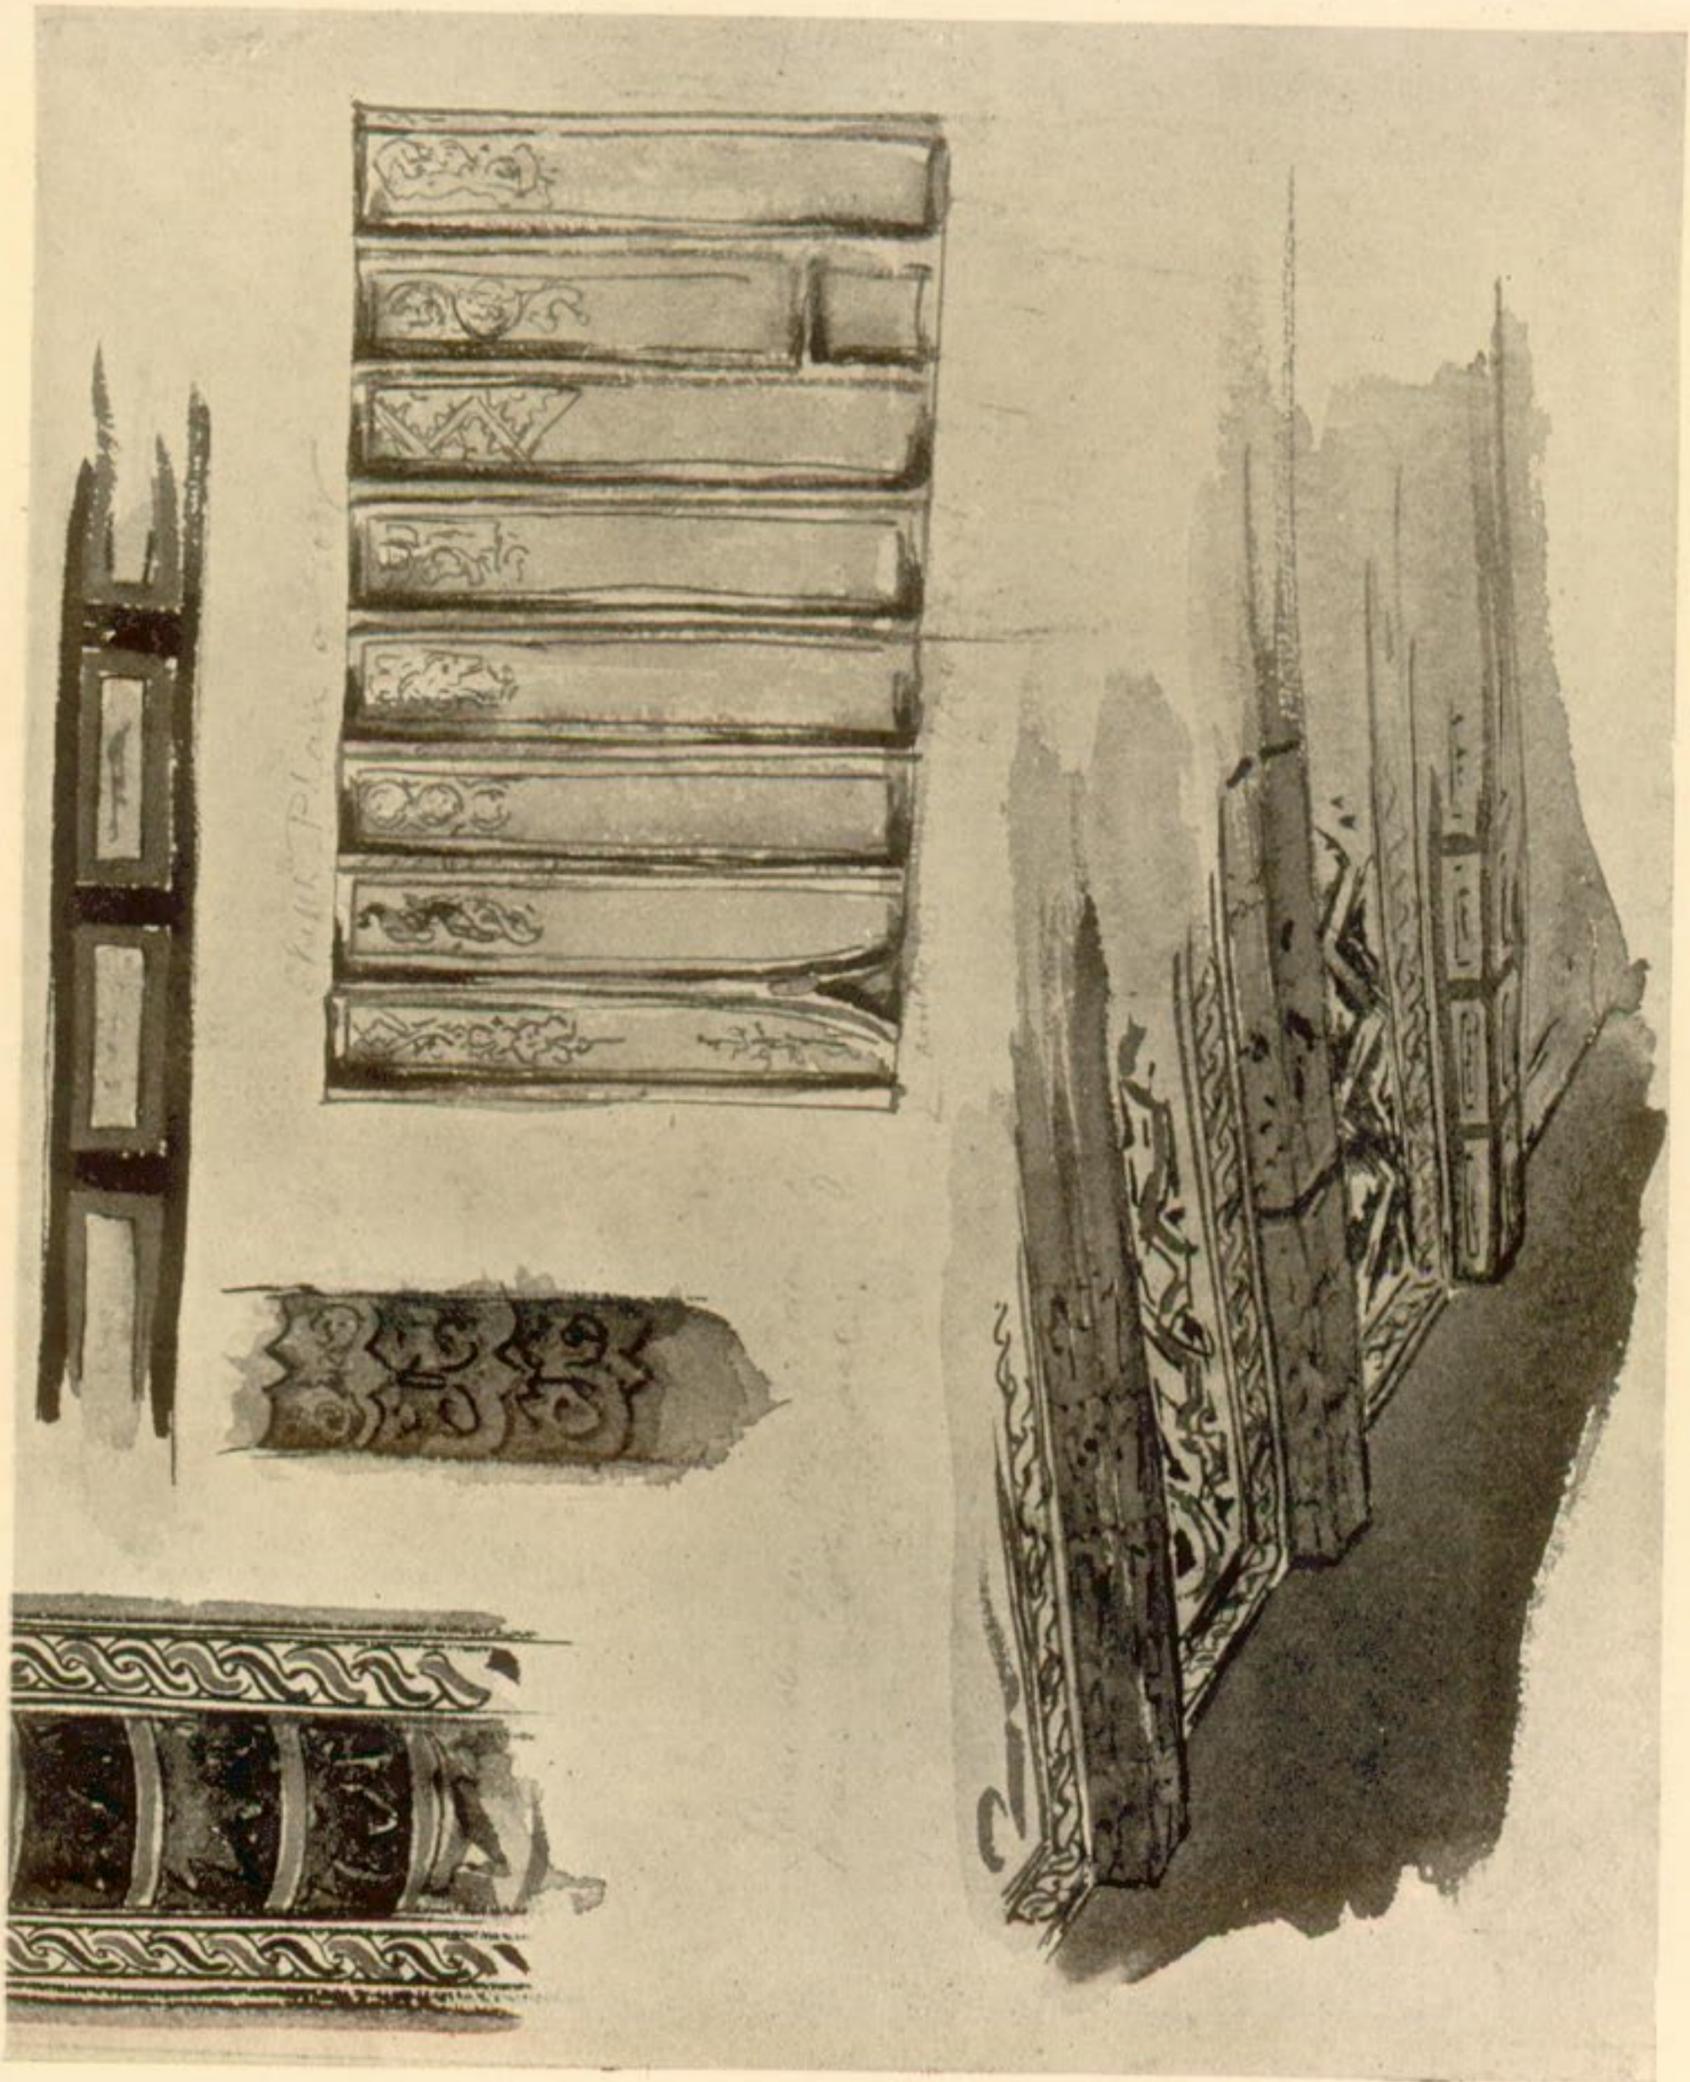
Details of Ceiling of the Hall in Cessnock Castle, Ayrshire.
